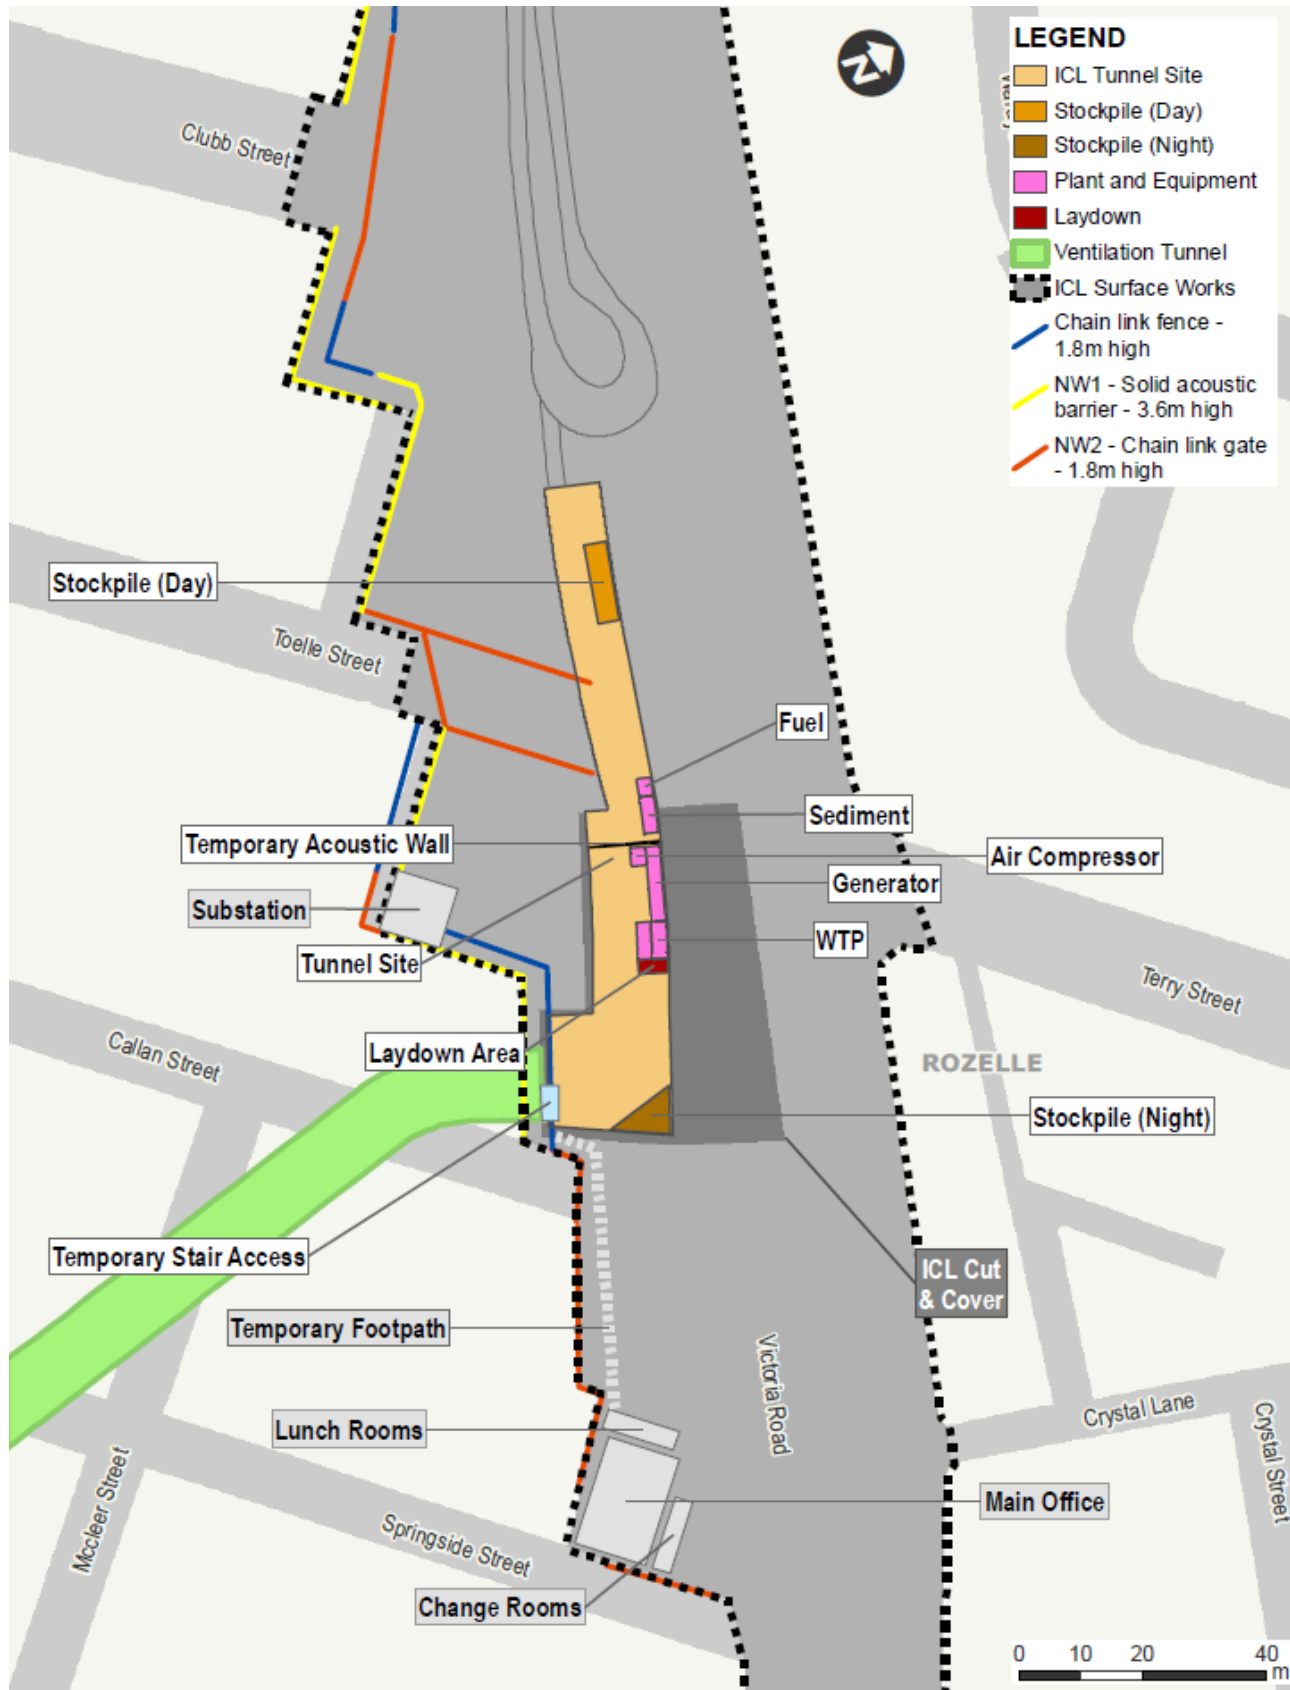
Indicative Iron Cove cut and cover tunnel support site layout
